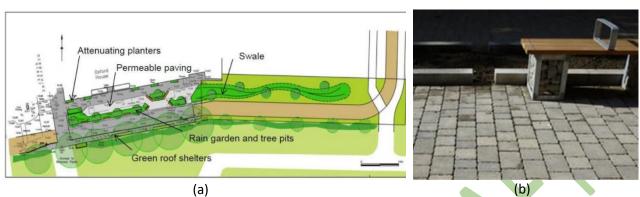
(a) Derbyshire Street proposed layout (b) Derbyshire permeable pavement
